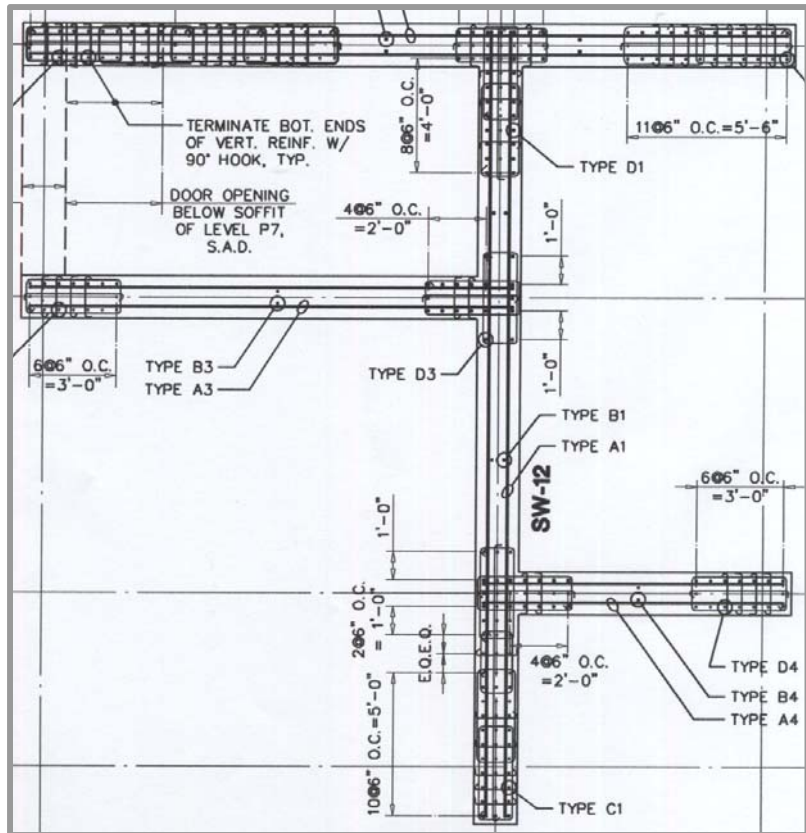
Example of Shear Wall System (Levels 7-9)
